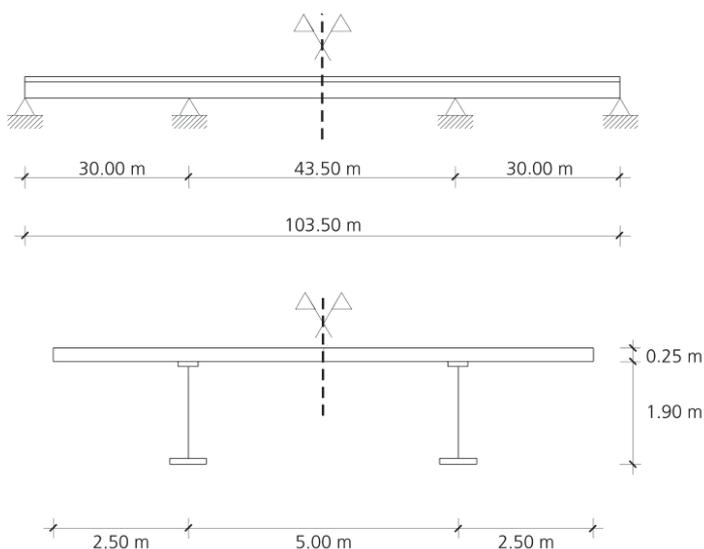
Case study for comparison between Spanish recommendations and Eurocodes for steel and steel and concrete composite bridge design [1], [17].
